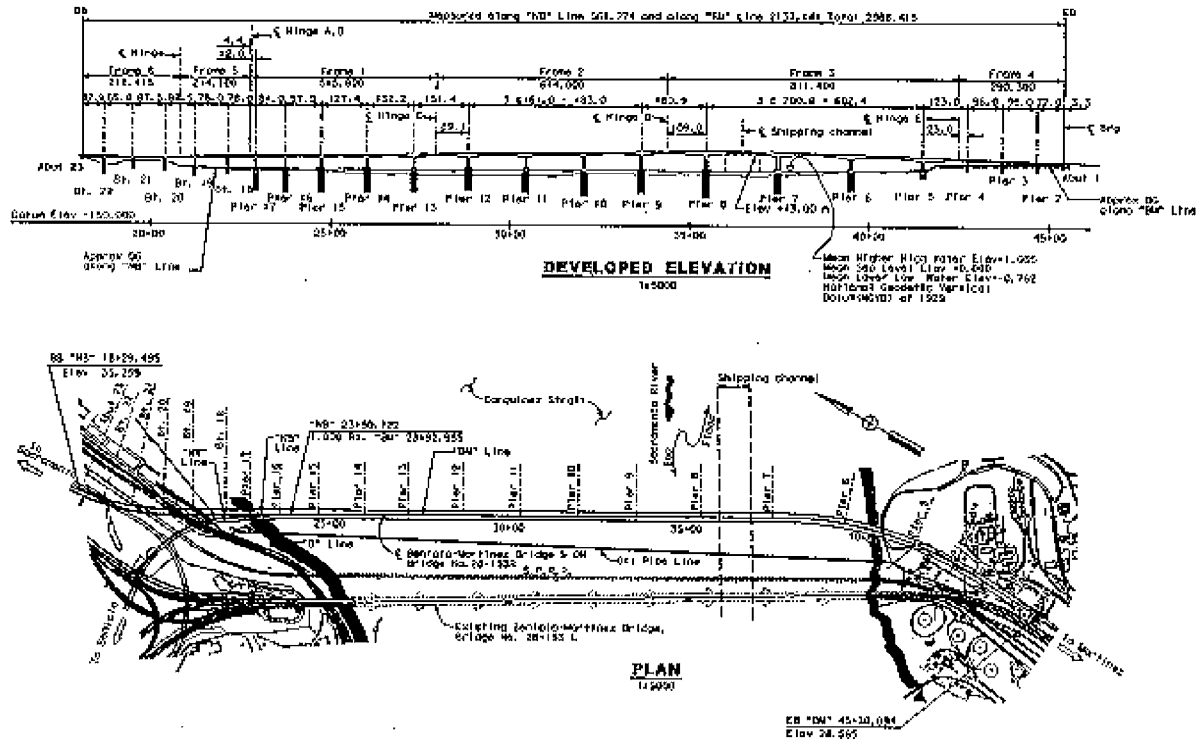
Benicia-Martinez Bridge Plan and Elevation Details
